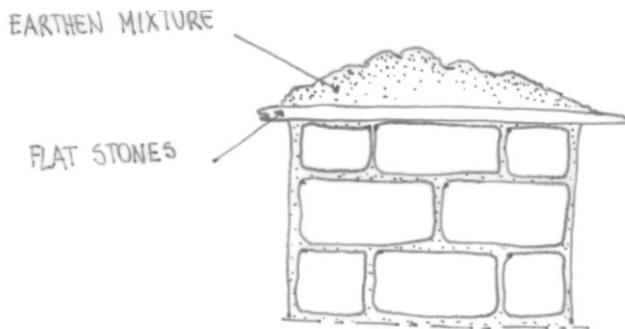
Protecting the top of the walls with sacrificed layer
